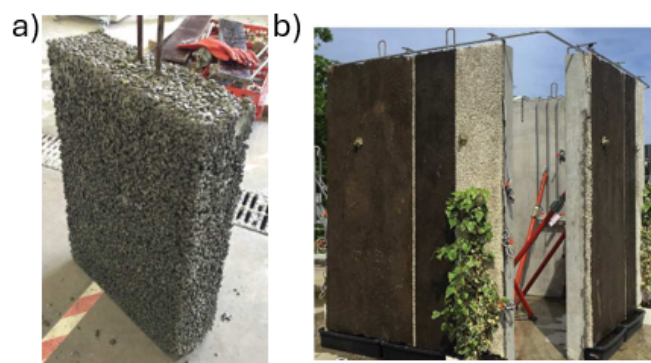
Two-layer wall structure a) Mini-wall validated construction methodology and mix design b) full-size construction with seeded substrate completed as studied by Riley, et al. [6].
